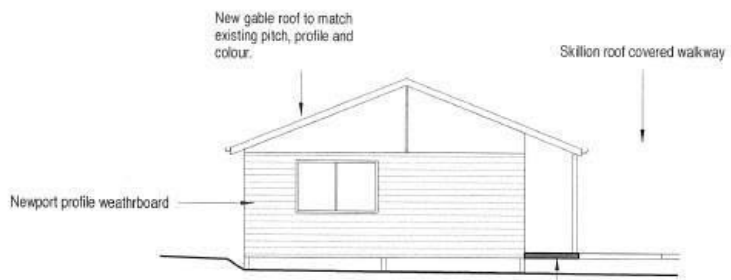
Perspectives detailing alterations and additions to primary dwelling
